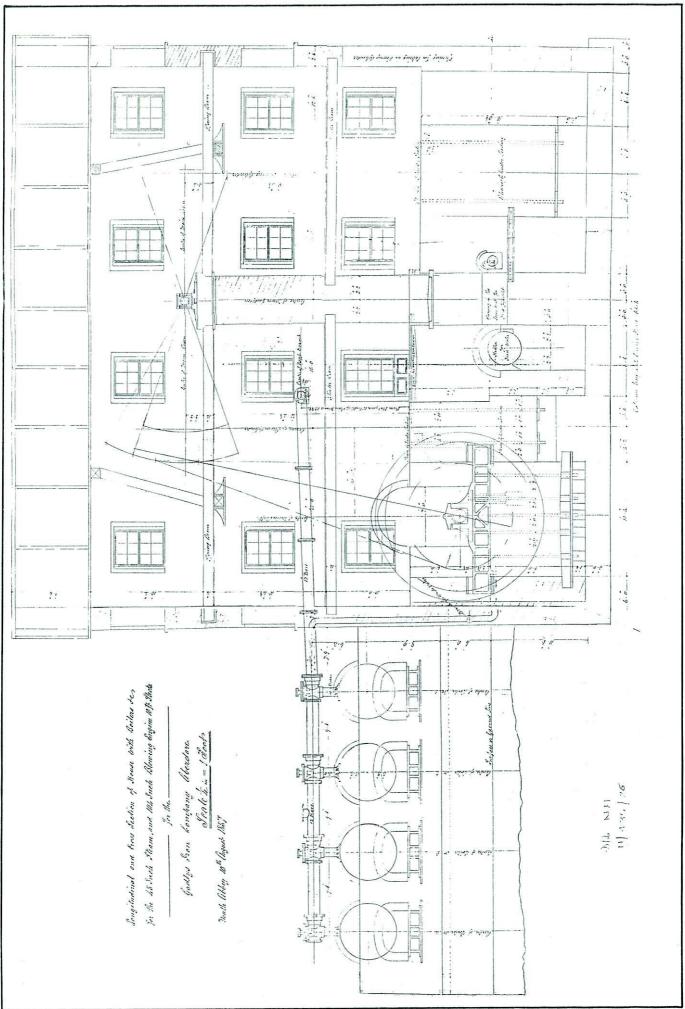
Longitudinal Sectional Elevation of the 1857 Blowing Engine House and Boilers. (GAS D/D NAI M/435/26)
